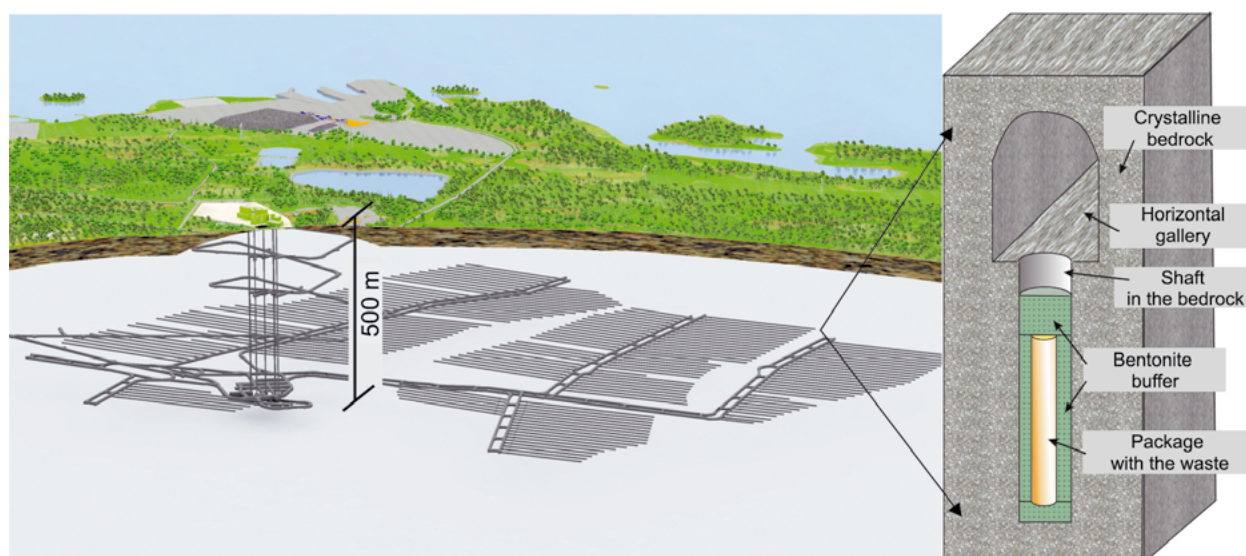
KBS-3 concept for SNF disposal. The general layout of tunnels in the underground facility (on the left), the inset shows the layout of a waste canister in an underground gallery (from [17, 18] with modifications)
